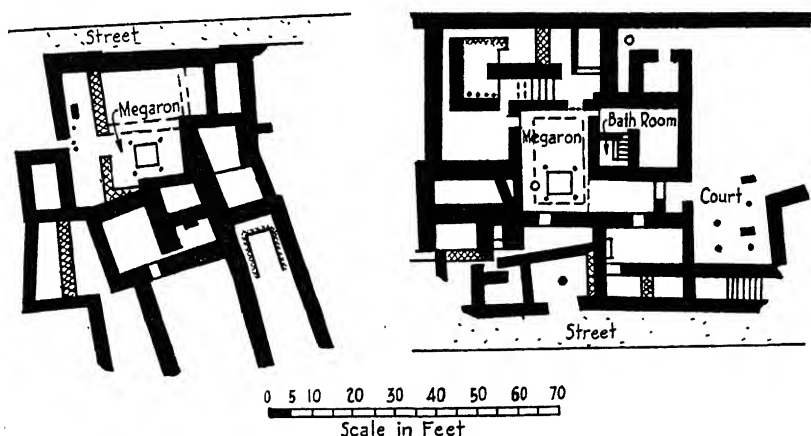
PLANS, HOUSES AT PALAIKASTRO
